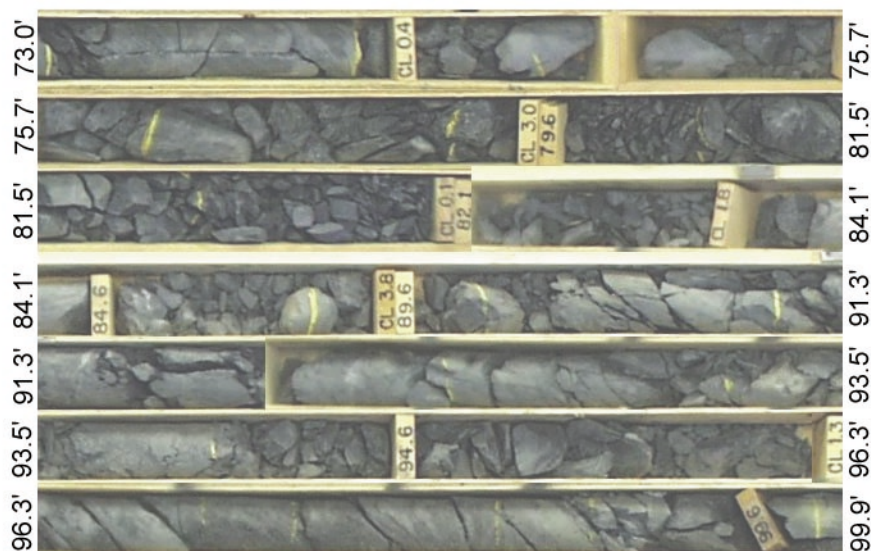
Fault GG-2 from 73.0 feet to 99.4 feet in Golden Gate Dam drill hole RC-1
